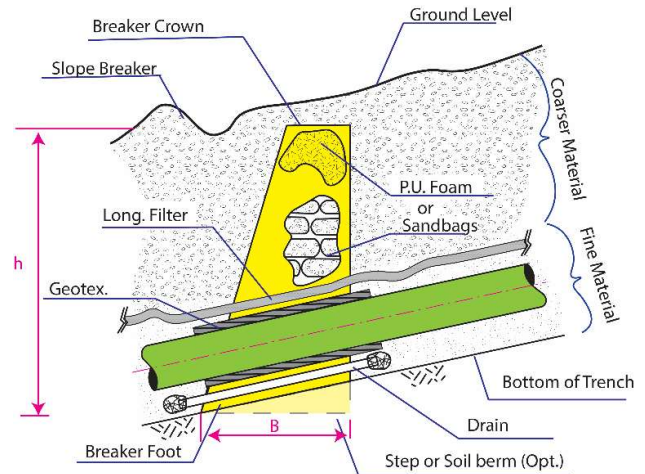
TYPICAL TRENCH BREAKER CONFIGURATION – LATERAL VIEW. FOR HIGH INCLINATION, THE BOTTOM OF THE TRENCH IS LEVEL, FORMING A SOIL BERM (DOT LINE).
